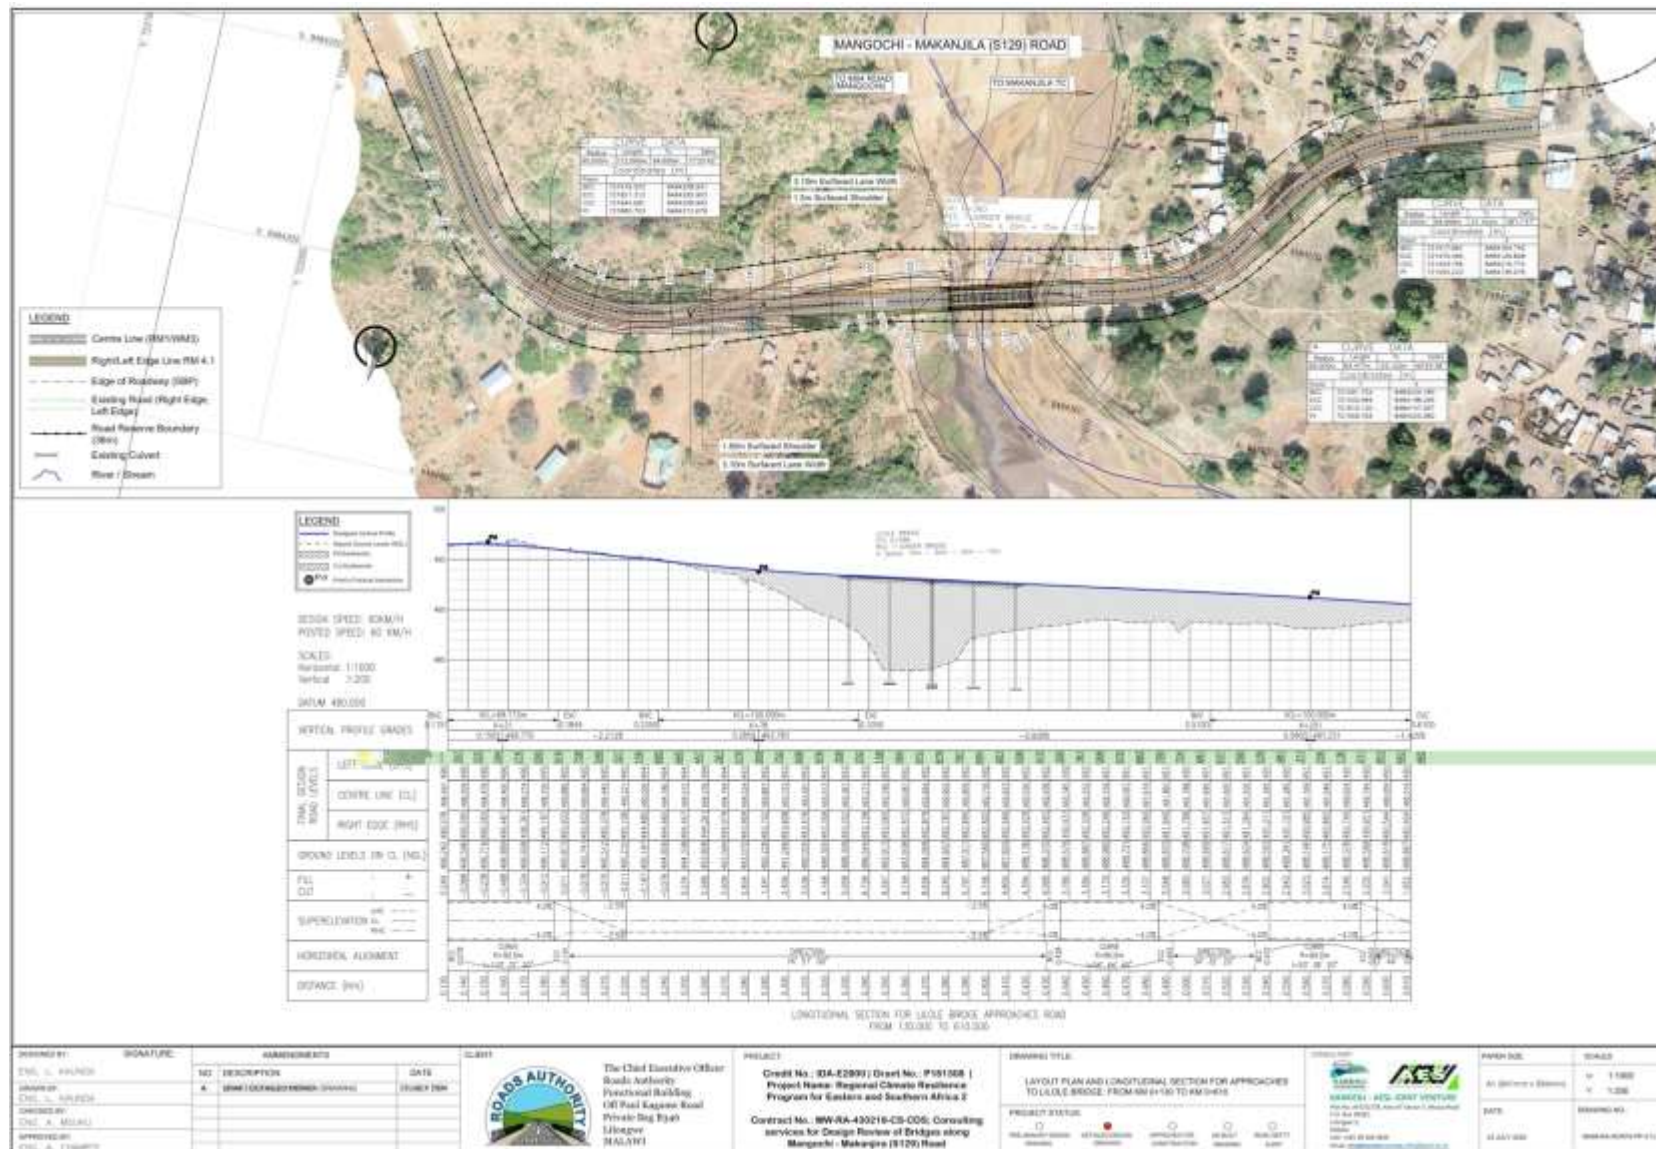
Lilole Bridge Layout Plan and Longitudinal Section for Road Approaches
